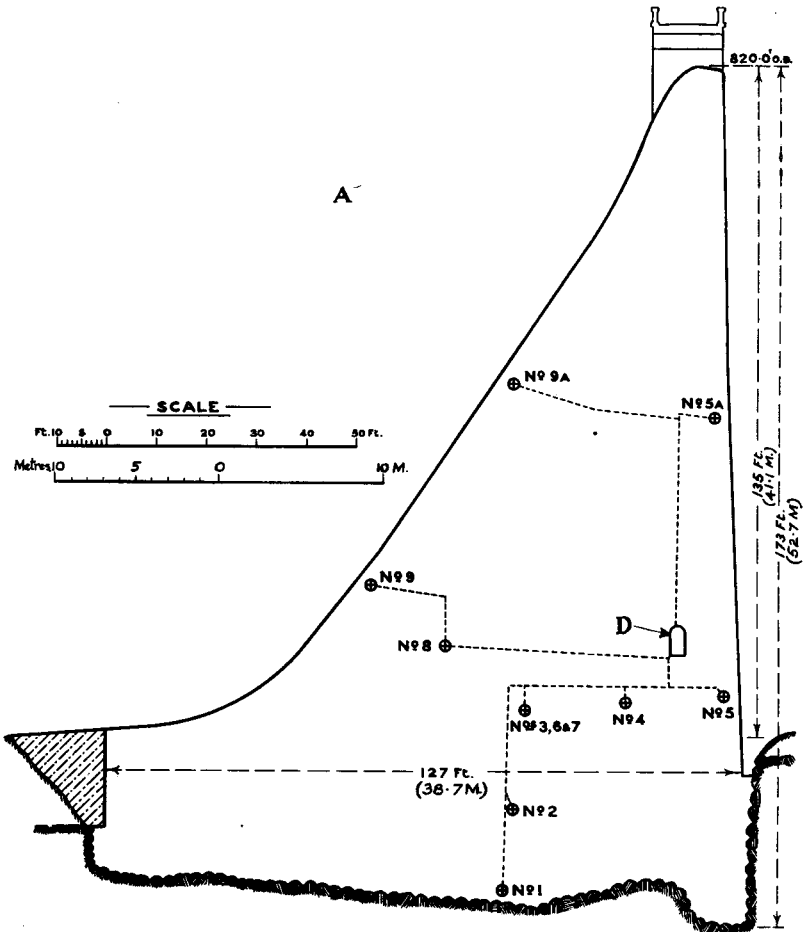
Cross section of Laggan Dam.—Profil du barrage de Laggan. — Durchstrich durch die Laggan-Talsperre. — Perfil de la presa de Laggan.
